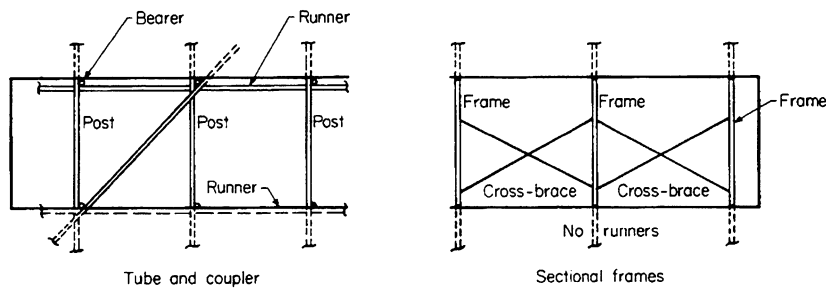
Side View of Tube-and Coupler and Frame-Type Shoring
